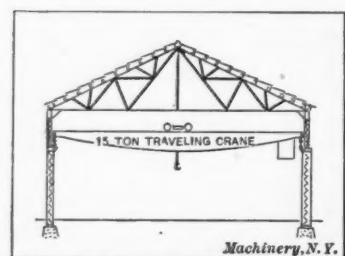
End Elevation, Machinery Demonstrating Building, Joseph T. Ryerson & Son, Chicago
